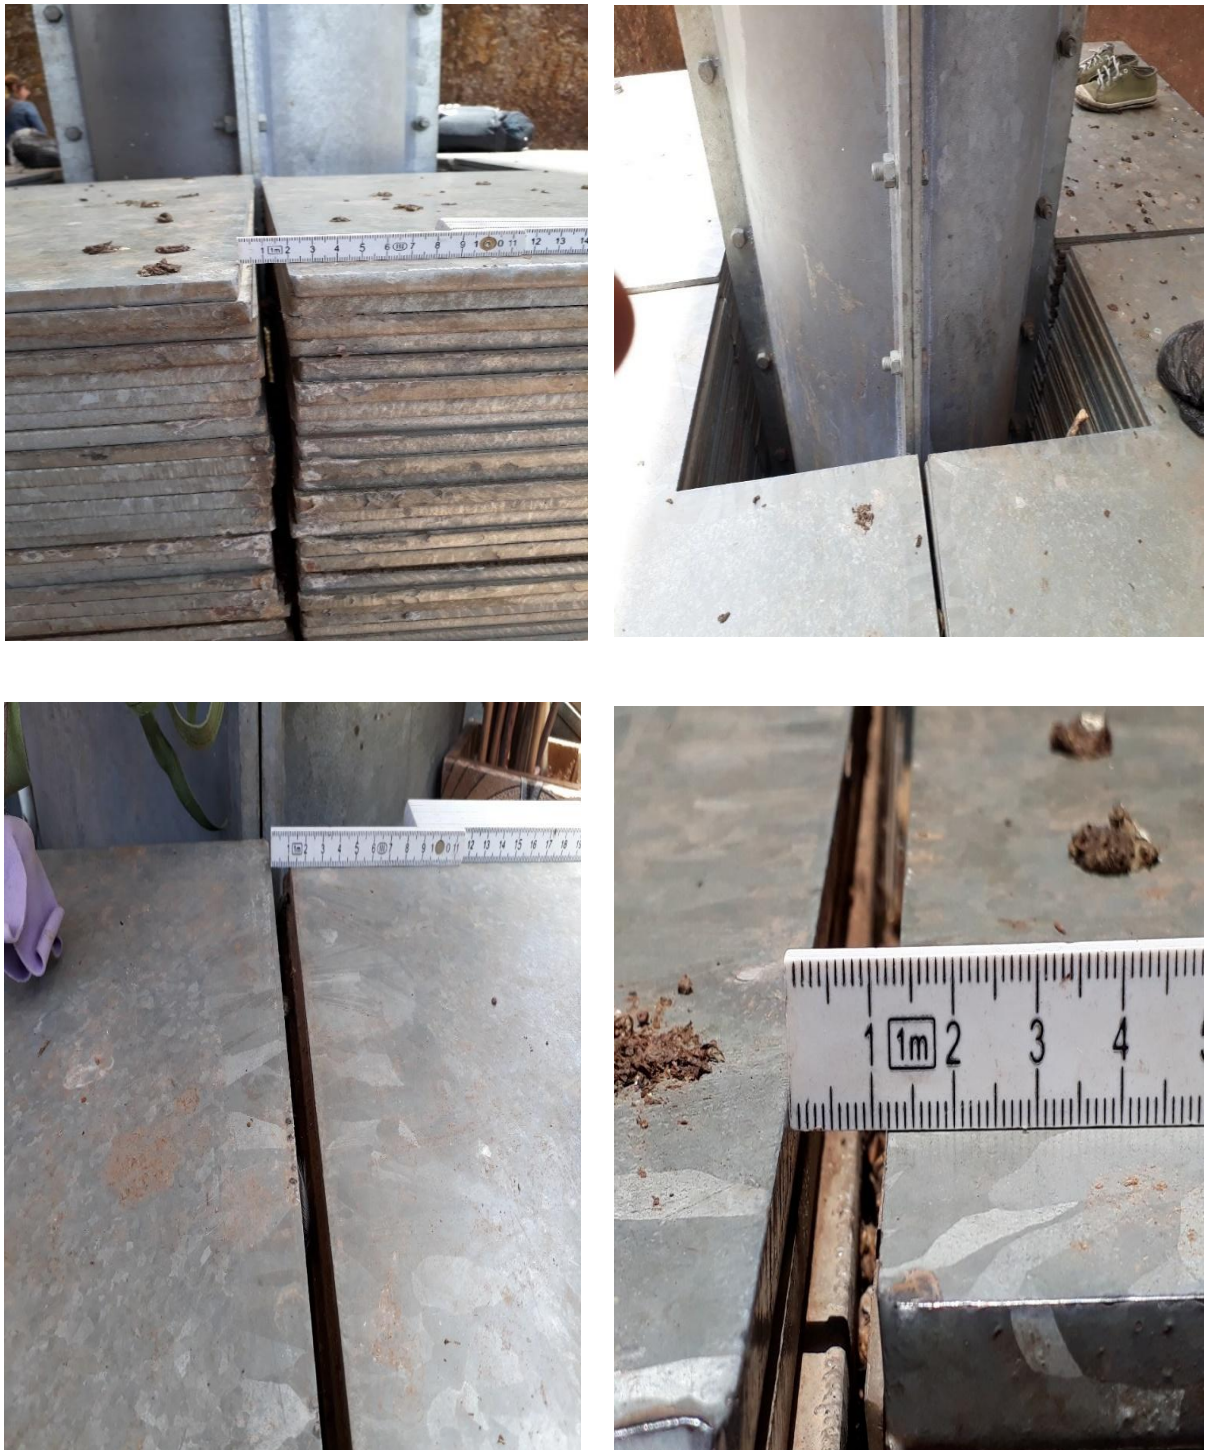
Column-A2 and A4 (It's been witnessed that different width of openings occurred on the base plates in four direction)
